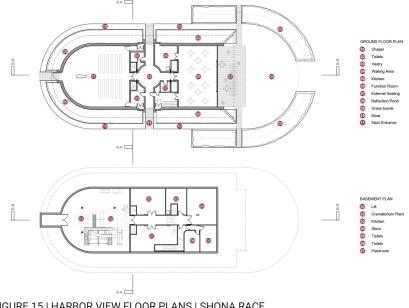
| HARBOR VIEW FLOOR PLANS | SHONA RACE
